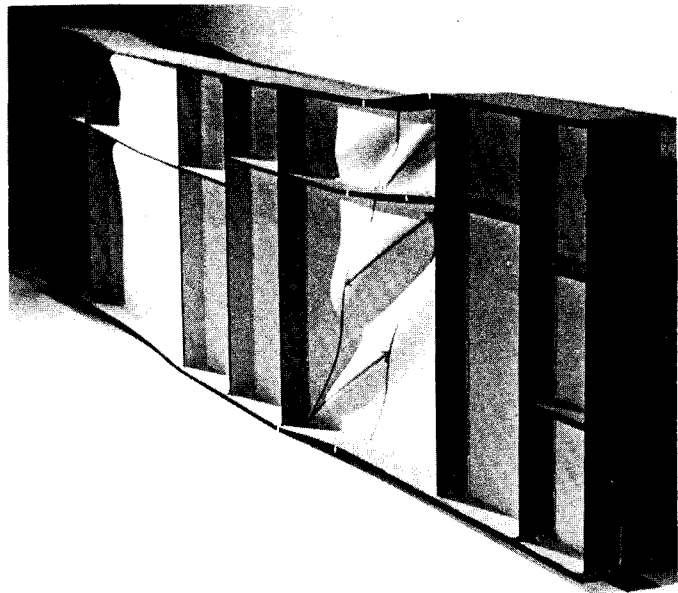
Longitudinally stiffened girder at ultimate load in shear (Rockey et al., 1974).
